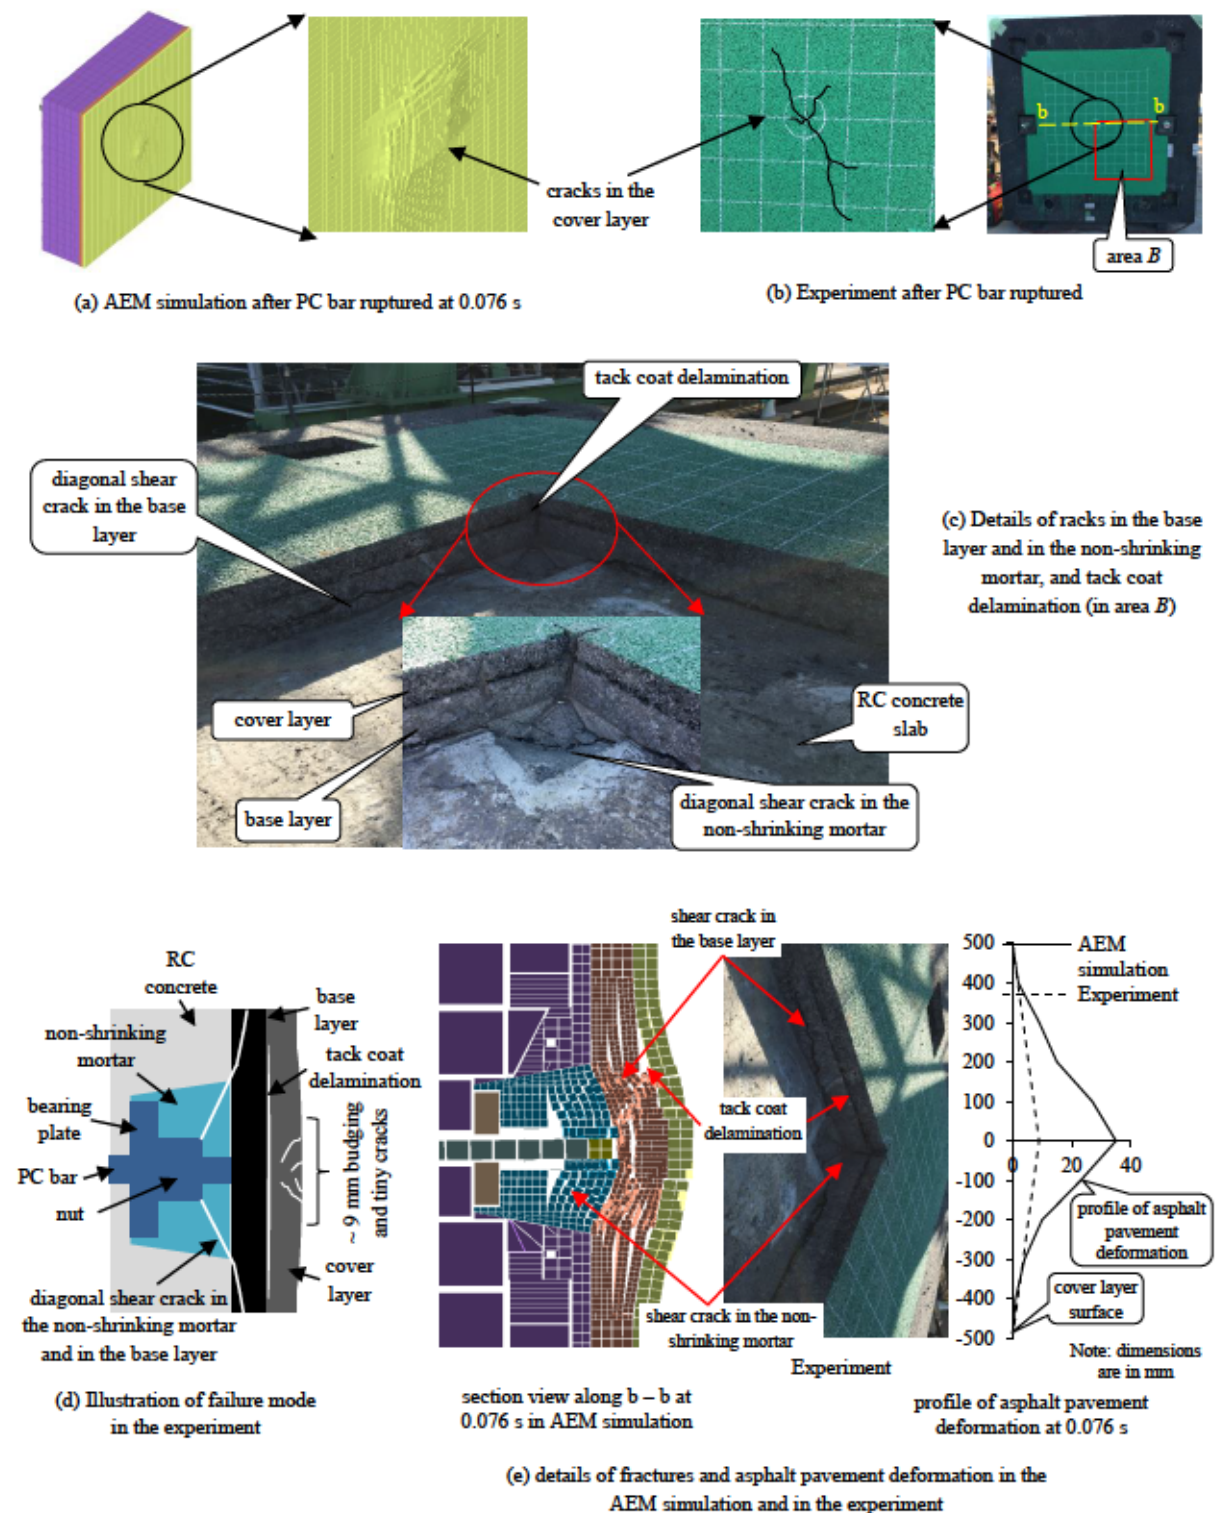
Failure modes in the asphalt pavement after PC bar ruptured at 0°C [8]
